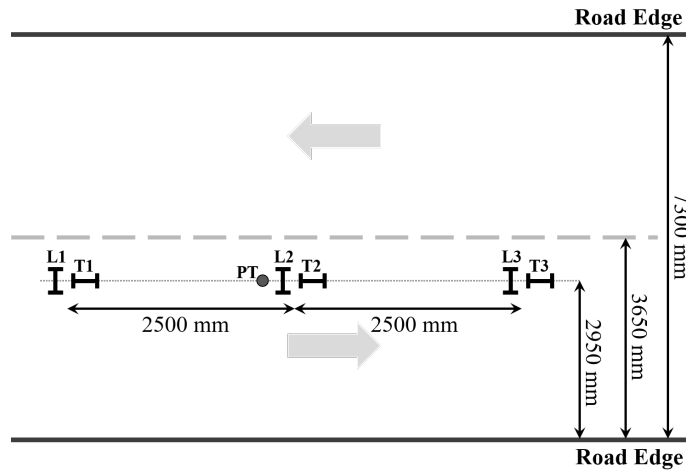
Top view layout of embedded sensor arrangement in a single test section in La Ferrière, where L: longitudinal ASG, T: transverse ASG, and PT: PT100.
